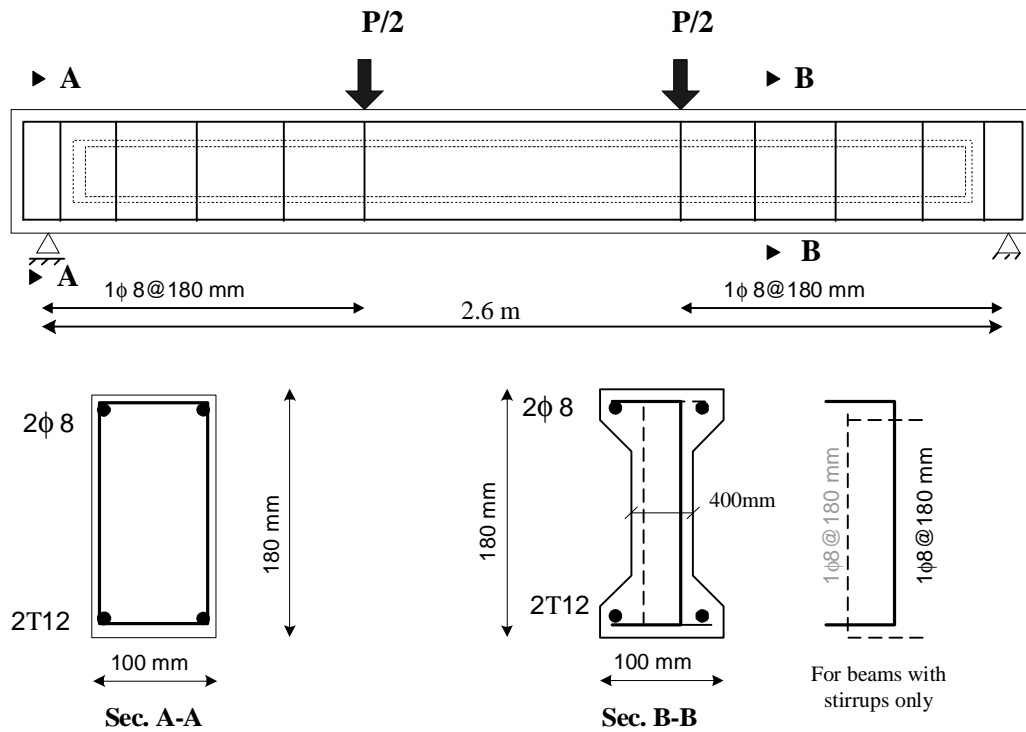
Dimensions and Reinforcement Details of Tested Beams
